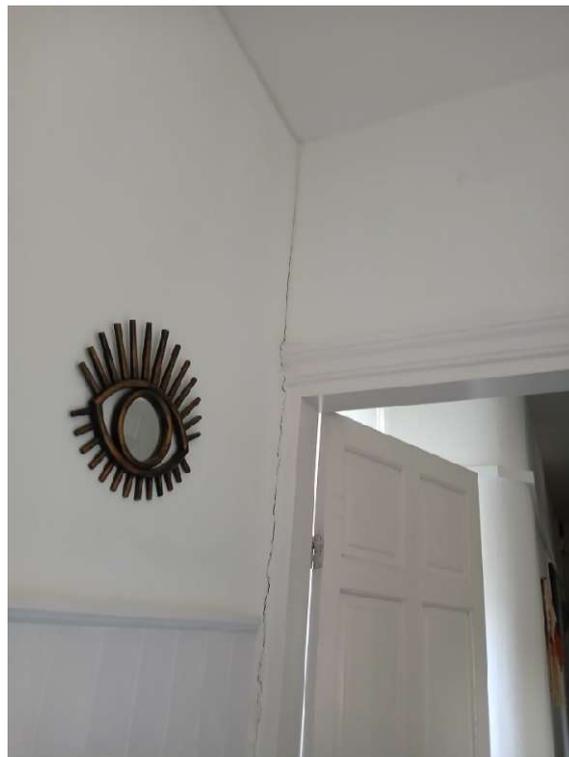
Vertical crack between cross walls and along ceiling in bathroom on gable wall.
